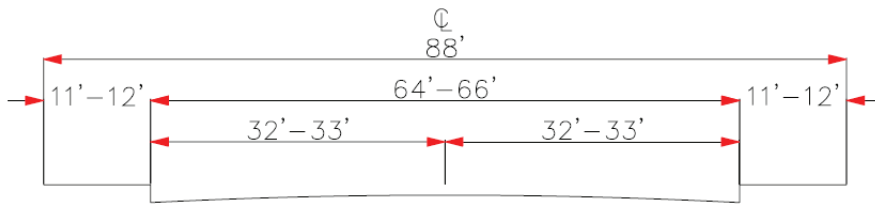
GENERAL PLAN STREET CLASSIFICATION
